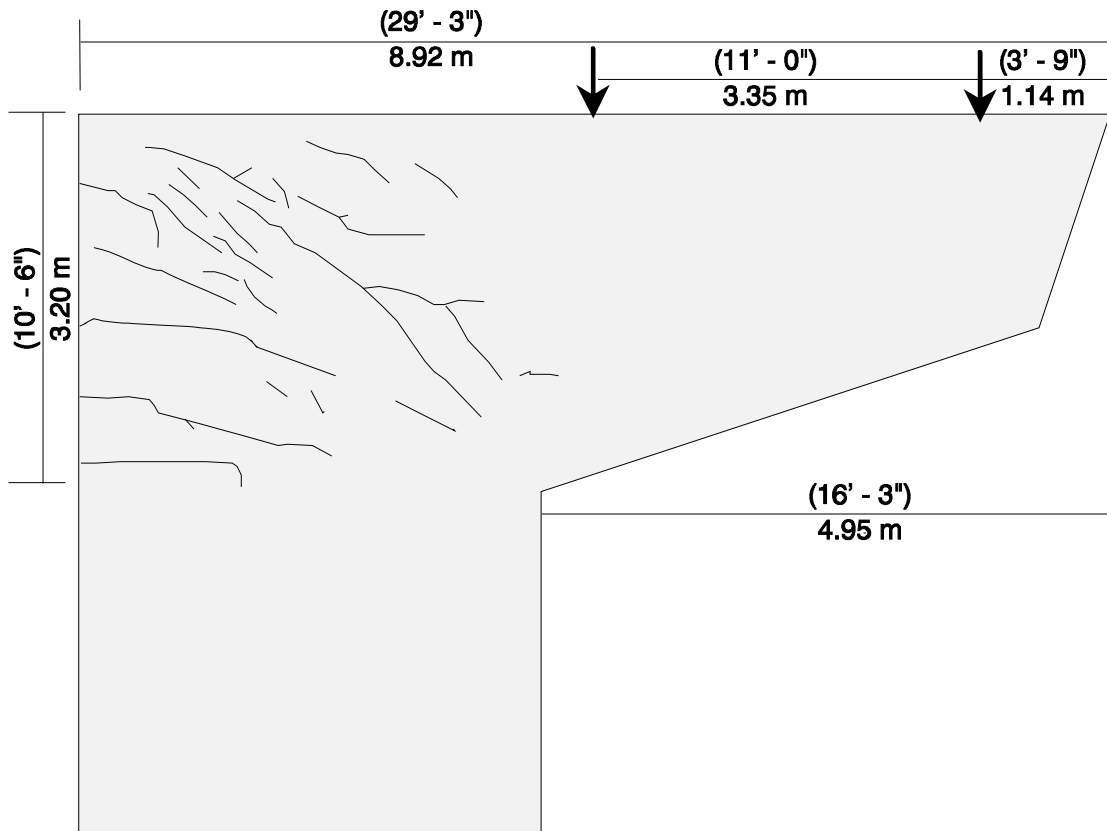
Pattern of Cracks in Pier D-36C
